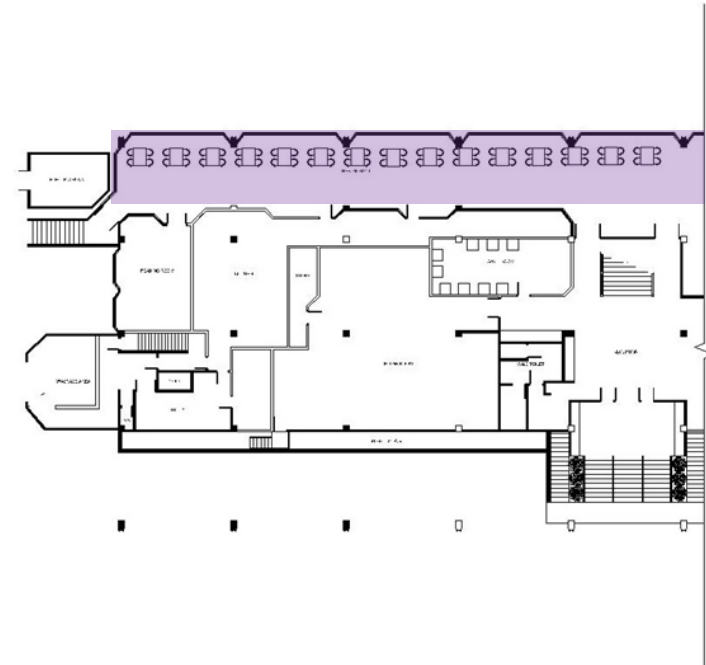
(b): Image of highlighted ground floor plan (Lim,2017)
